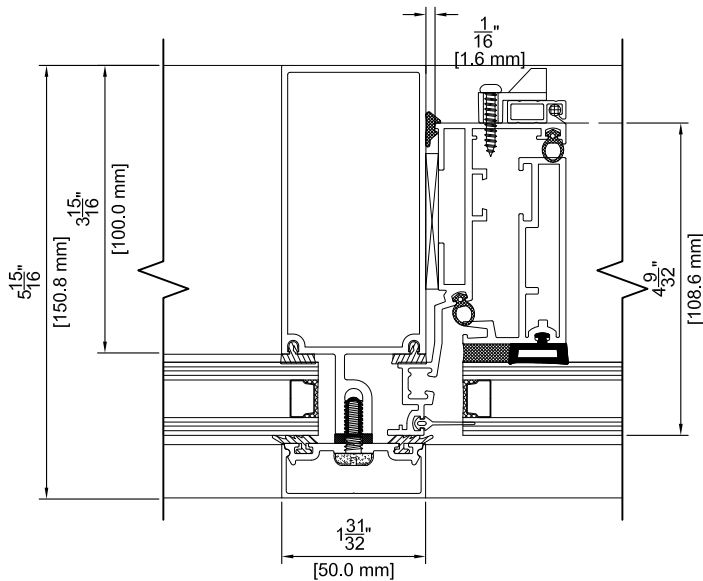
DETAILS SHOWING PHANTOM VENT WINDOW INSTALLED INTO VERSAWALL MIDLINE CURTAIN WALL. SEE THE WINDOWS SECTION FOR FURTHER INFORMATION ON THE PHANTOM VENT.
